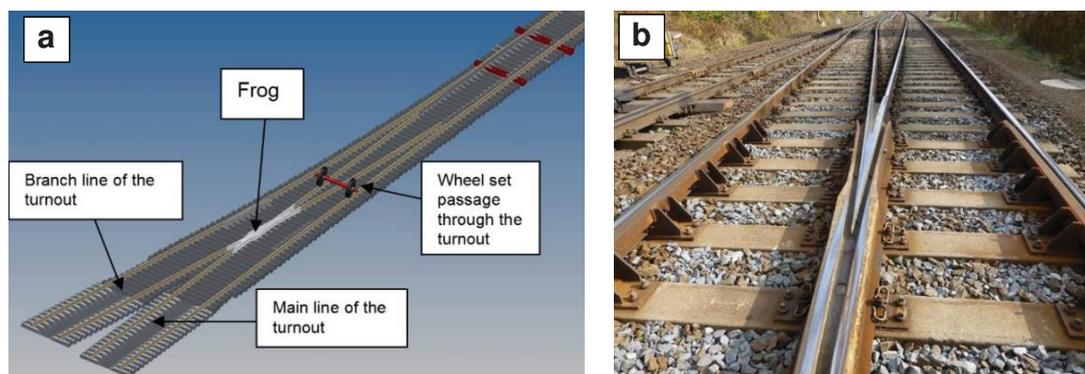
Railway turnout main parts (a) [1], crossing installed in the track (b)
